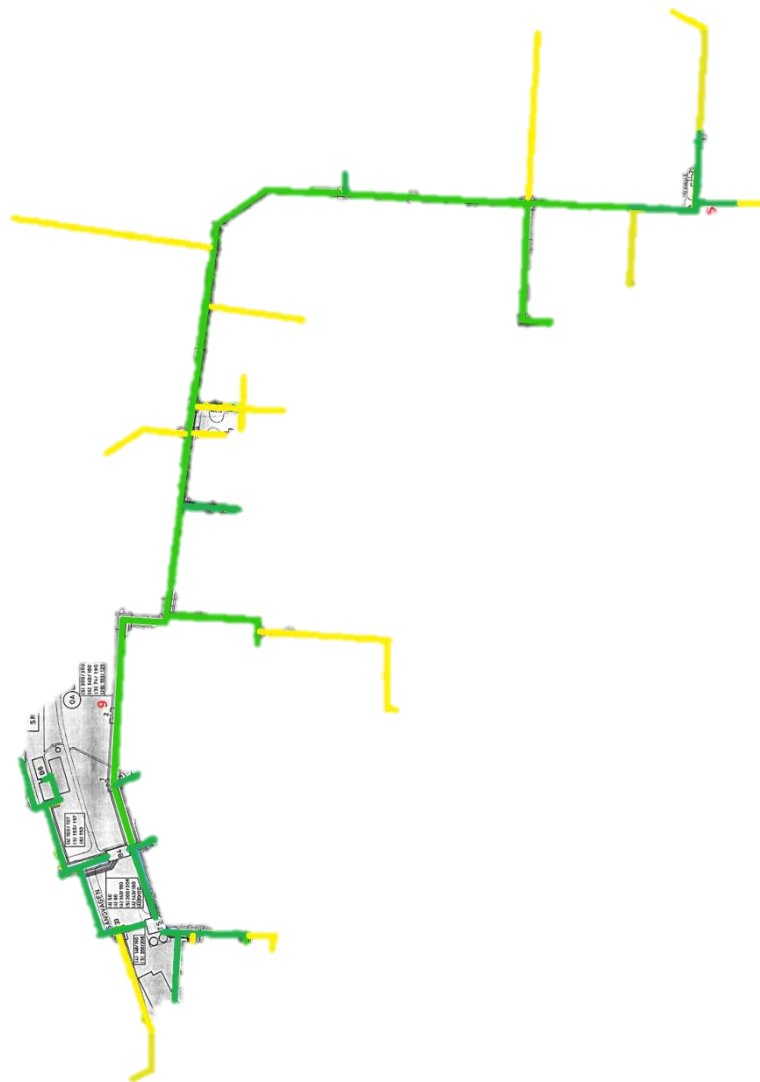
Principal layout of active culvert at Studsvik – remaining sections in green and sections to be decommissioned in yellow (by the time of reporting).
